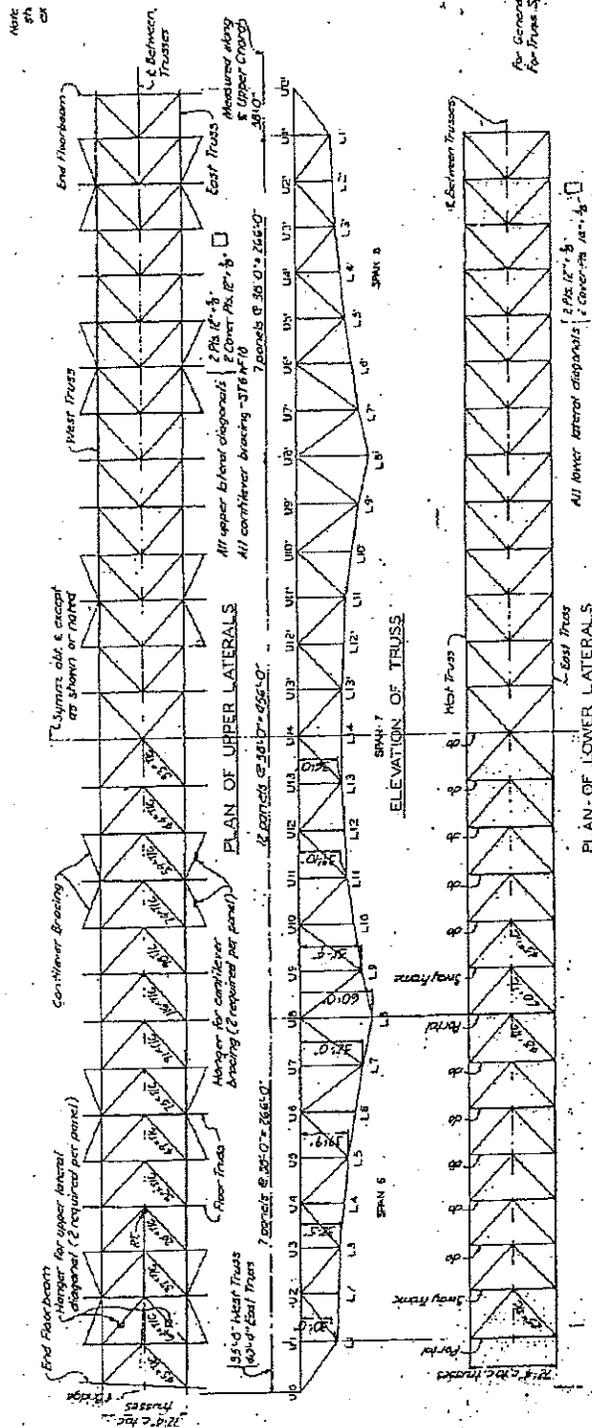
Deck Truss Framing Plan from Original Contract Plans
